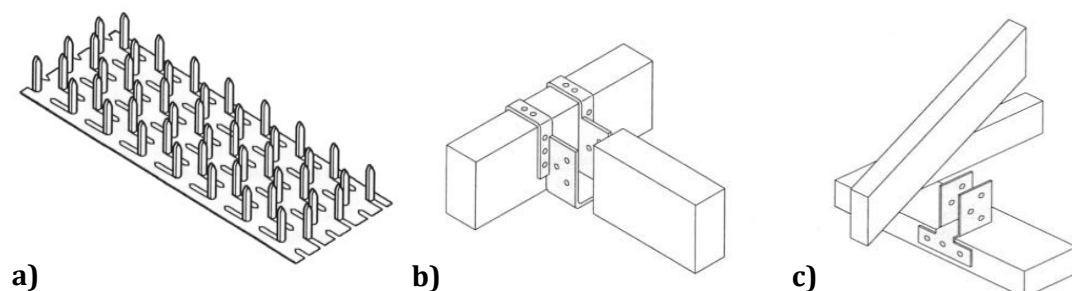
Types of connectors (a) punched metal plate (b) joist hanger (c) truss clip (TRADA Wood Information, 2003).
